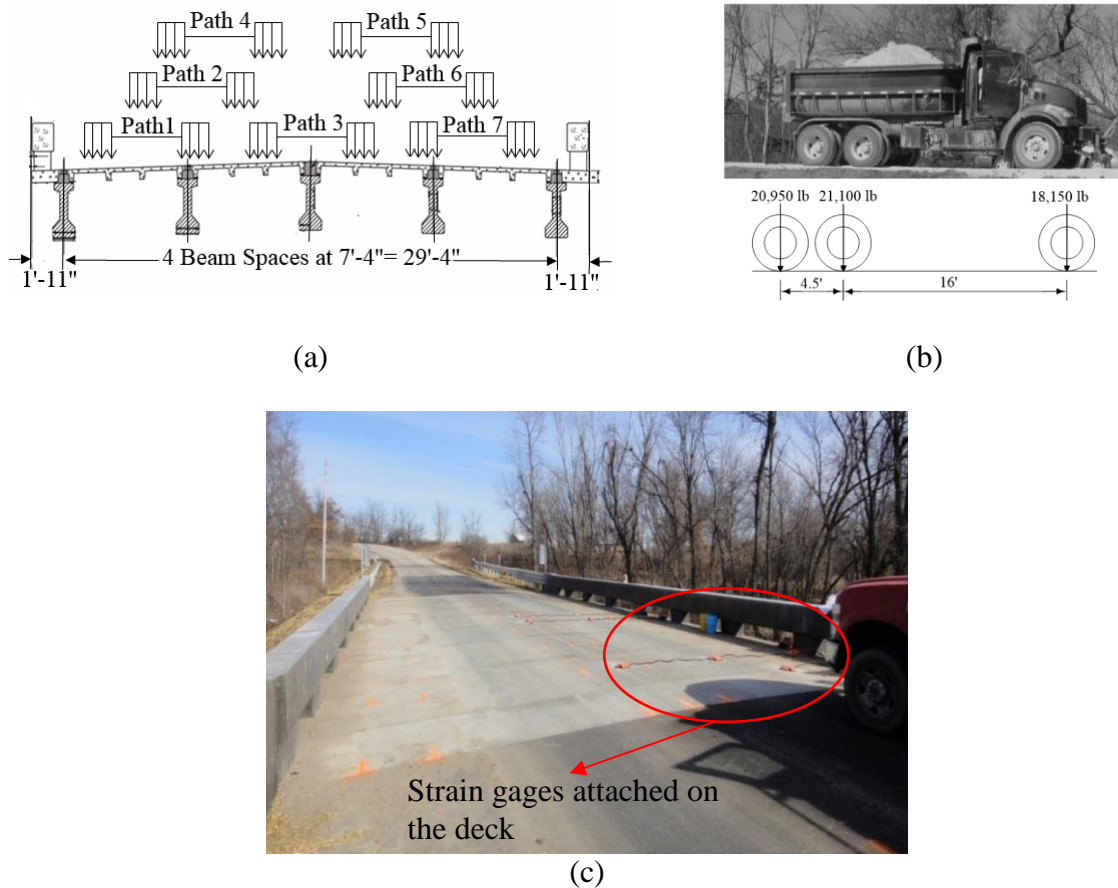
Loading: (a) Schematic layout of bridge loading paths; (b) Truck configuration and axle load; (c) Load paths marked on bridge deck
